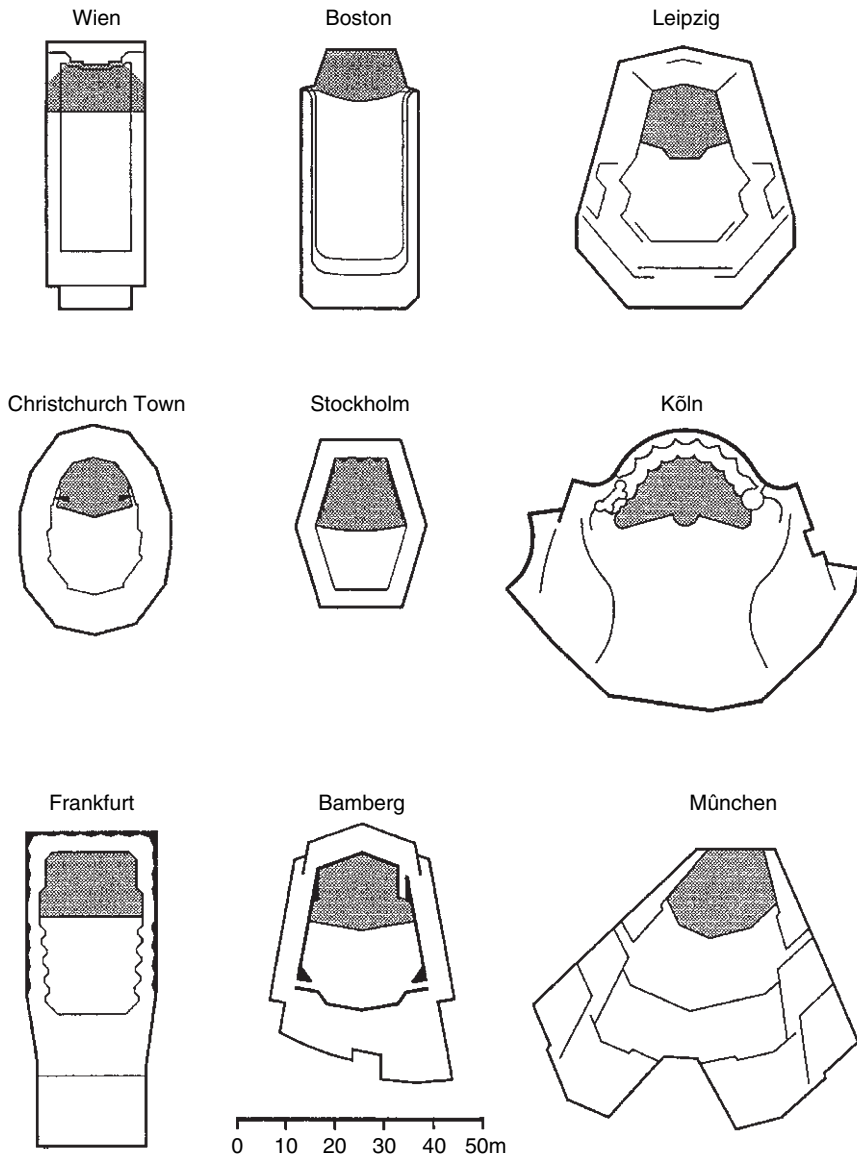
Floor plans of several concert halls. The shaded areas identify the stage
